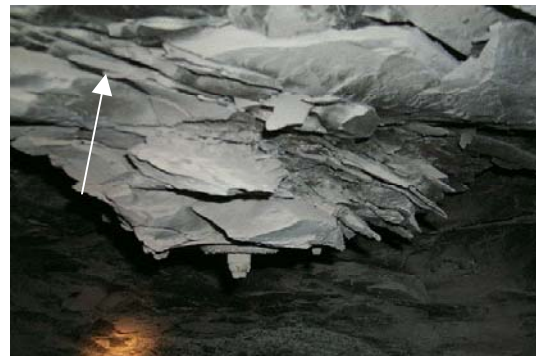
Bedding plane delamination (white arrow) in roof at Laurel Mountain mine.
